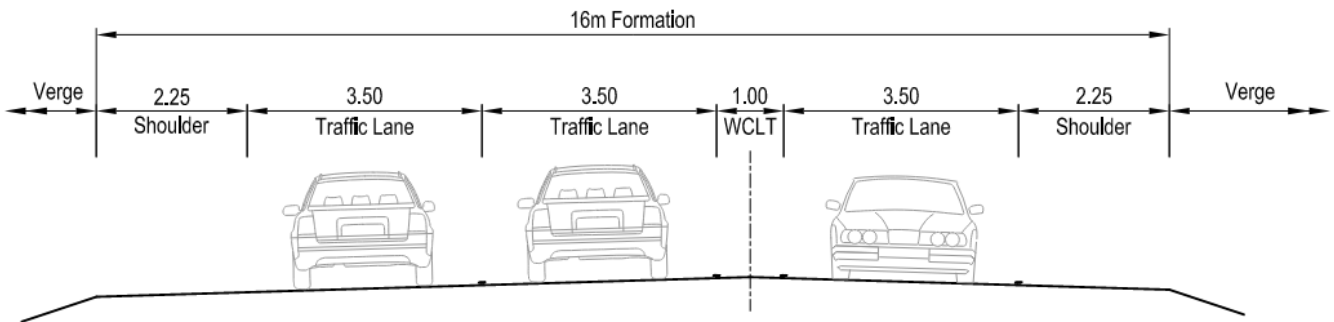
(e) – 16 m cross-section – overtaking lane arrangement
